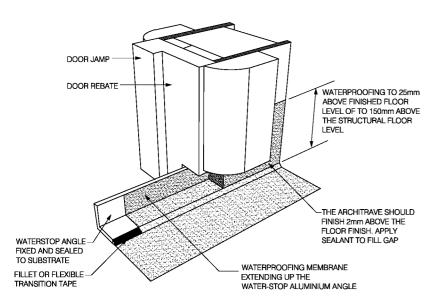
(A) EXAMPLE OF LIQUID WATERPROOFING AT DOOR OPENING FRAMEWORK
